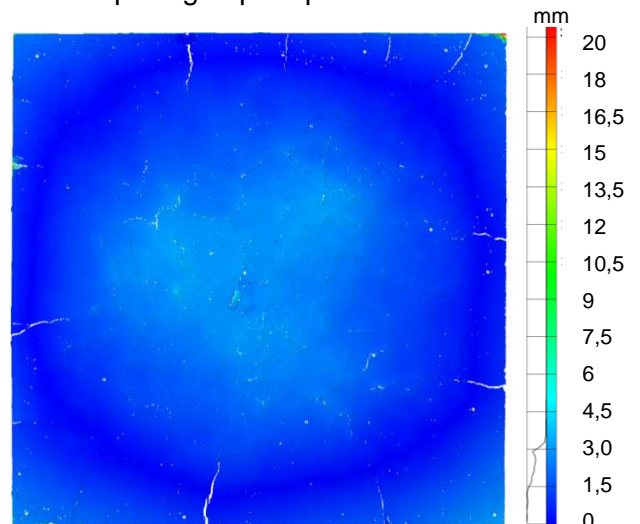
DFG-B15/6 - MFI25-2 kg/m³ - spalling volume 0%, only cracks and deformation
